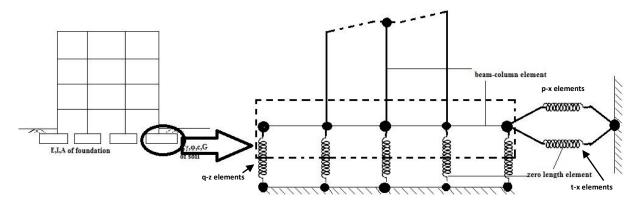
Soil-structure system with Nonlinear-Winkler-foundation Model
